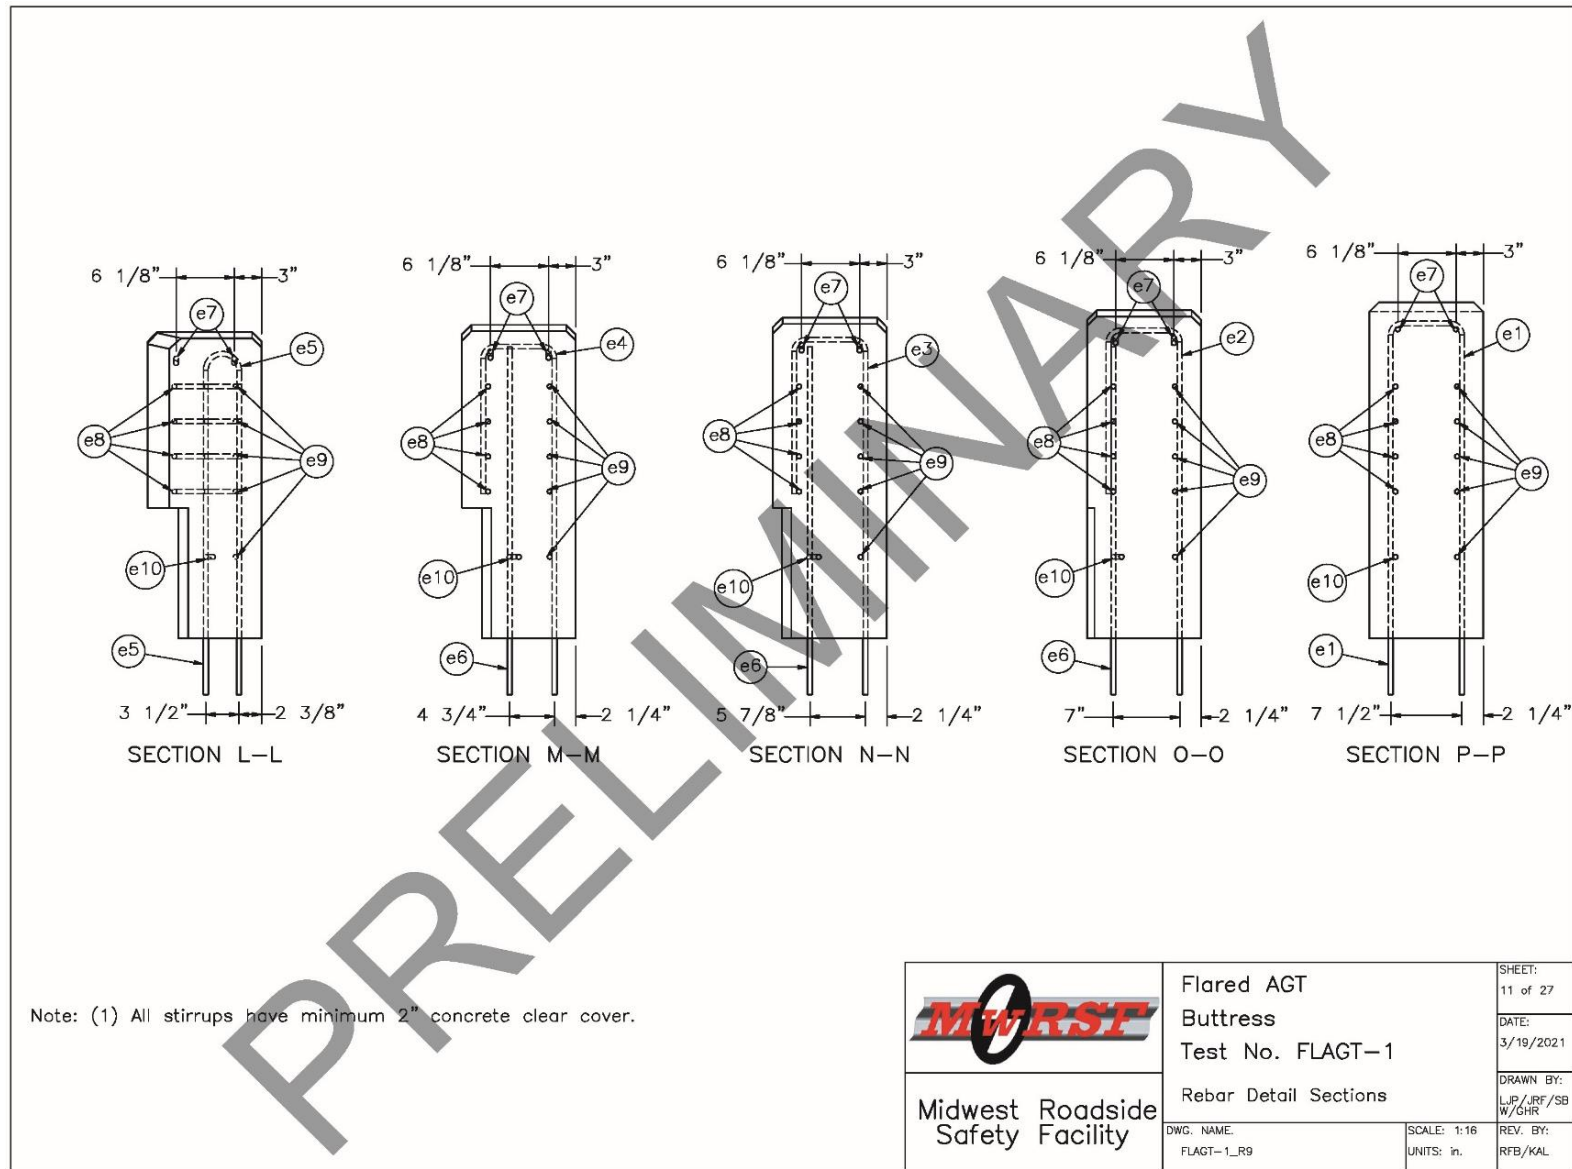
Rebar Detail Sections, Test No. FLAGT-1
